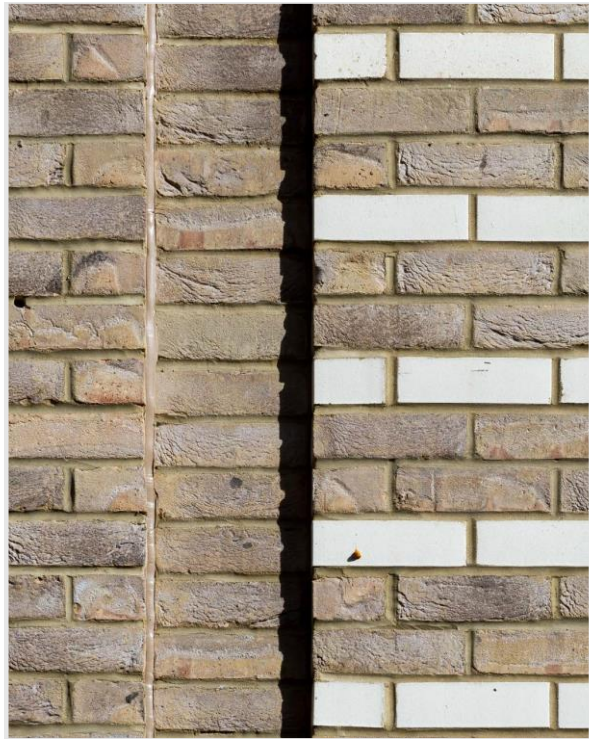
Examples of facade treatments providing depth and quality of architectural expression
